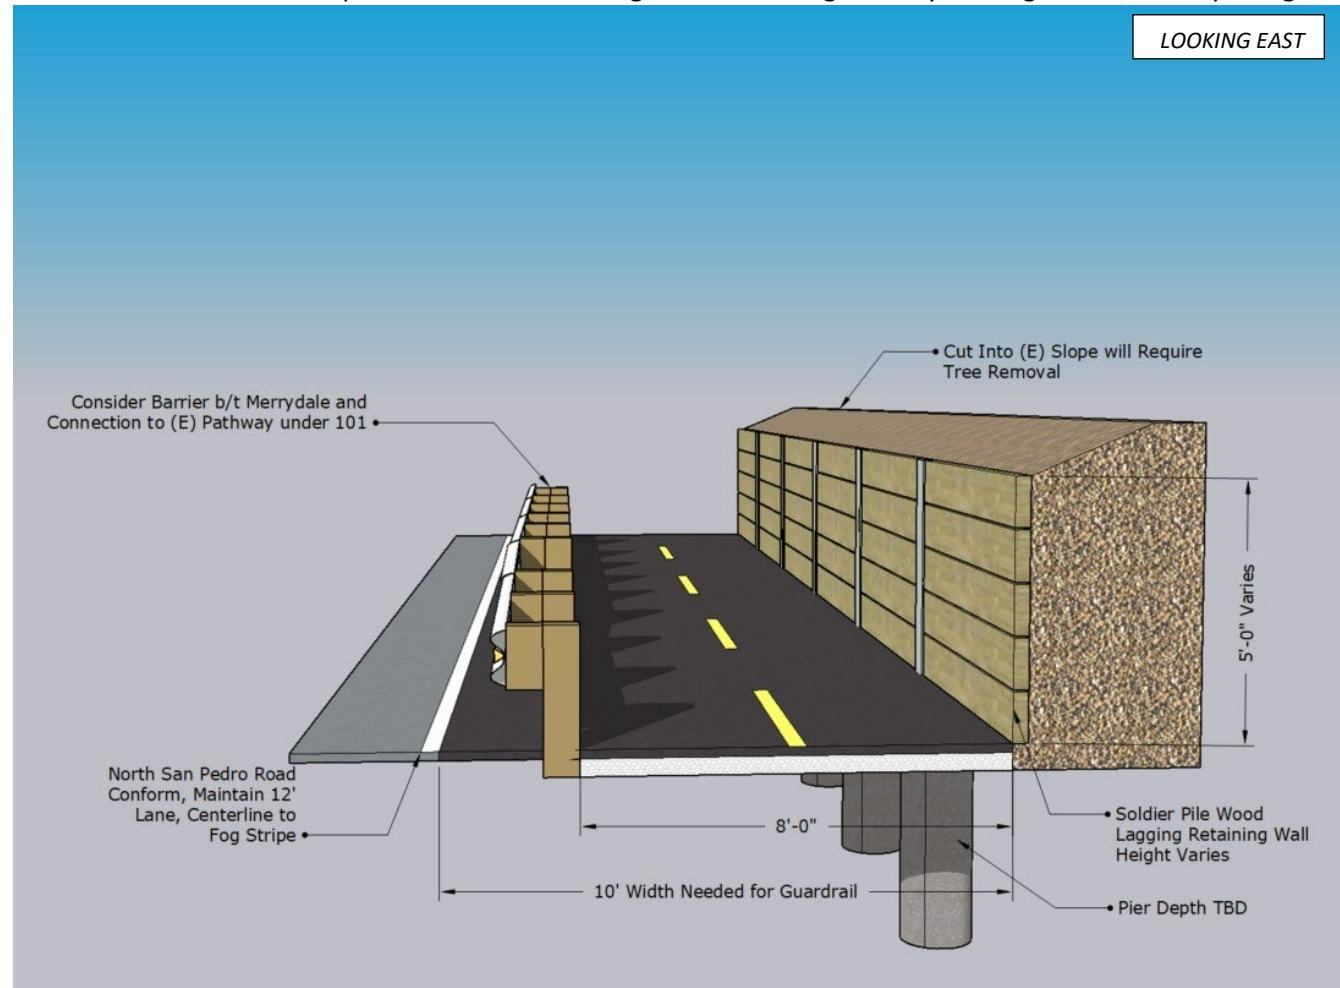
Light Blue Segment – Class I Bikeway connection to existing AC path under freeway
